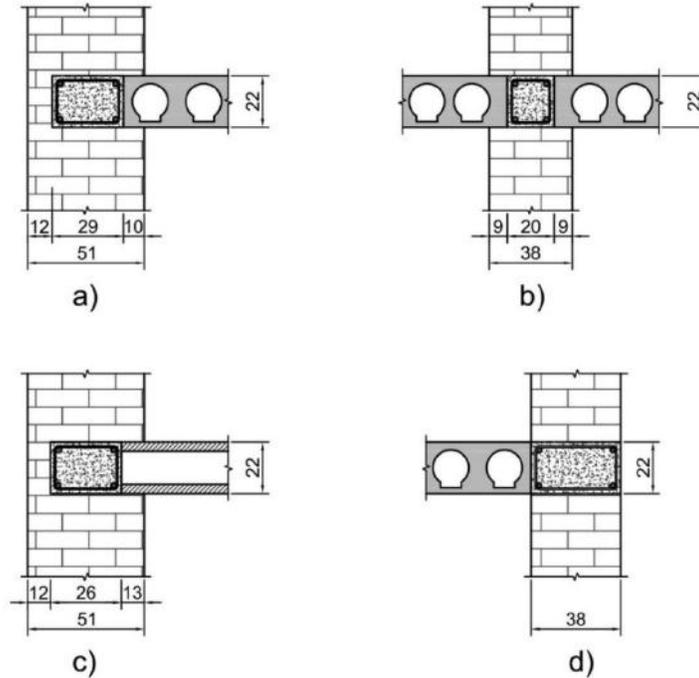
Details of wall-to-floor connections showing horizontal RC seismic belts.
